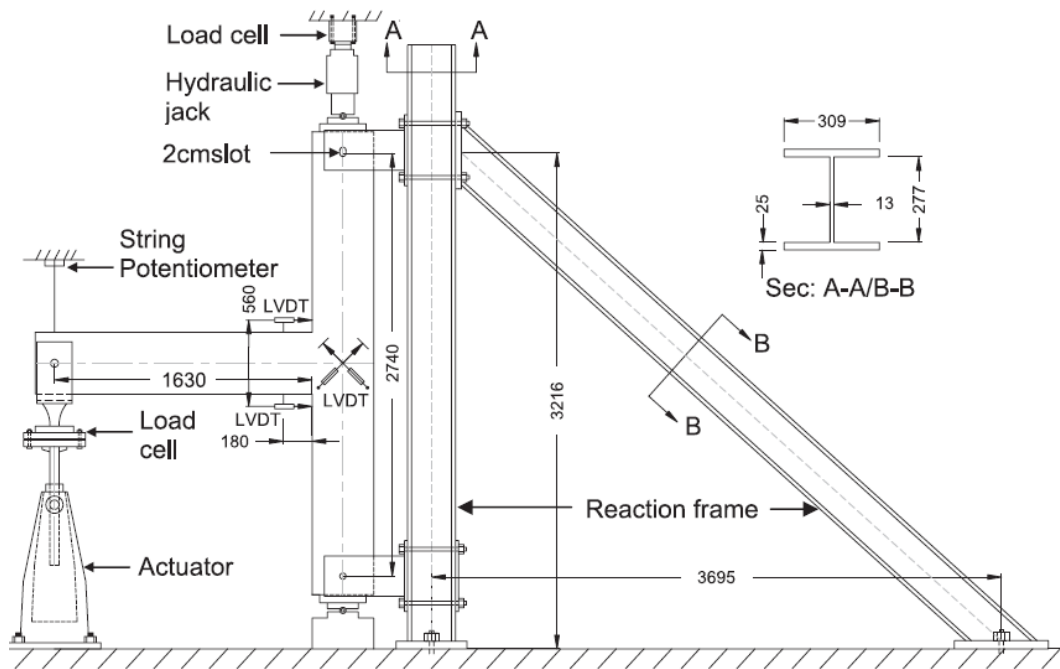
Test setup for exterior beam-column connection (Youssef et al., 2008)
